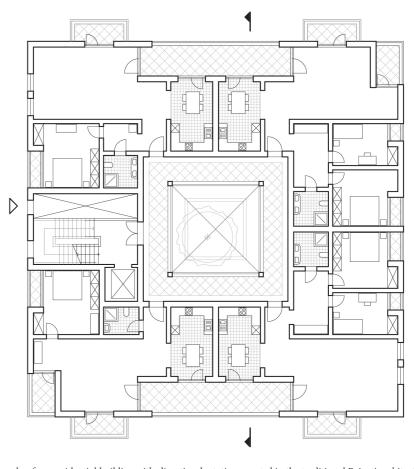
Examplary floorplan for a residential building with climatic adaptations, rooted in the traditional Beiruti architecture.
